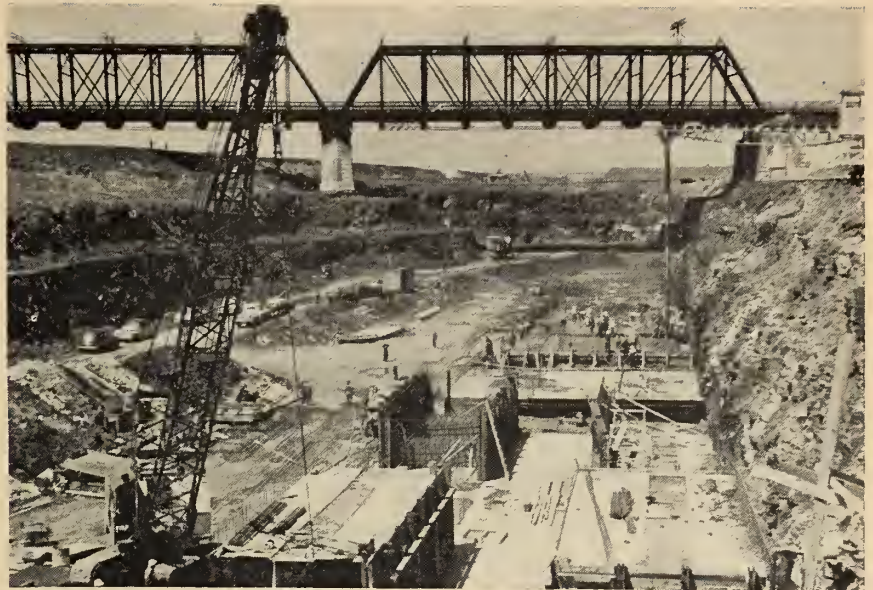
Initial construction at St. Lambert lock with first stage of excavation at Victoria bridge piers.
